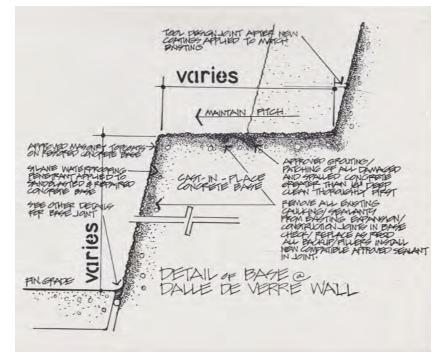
1986 Construction Detail at Base of Dalle de Verre Wall. Eberson and Toto, Detail E/5.
